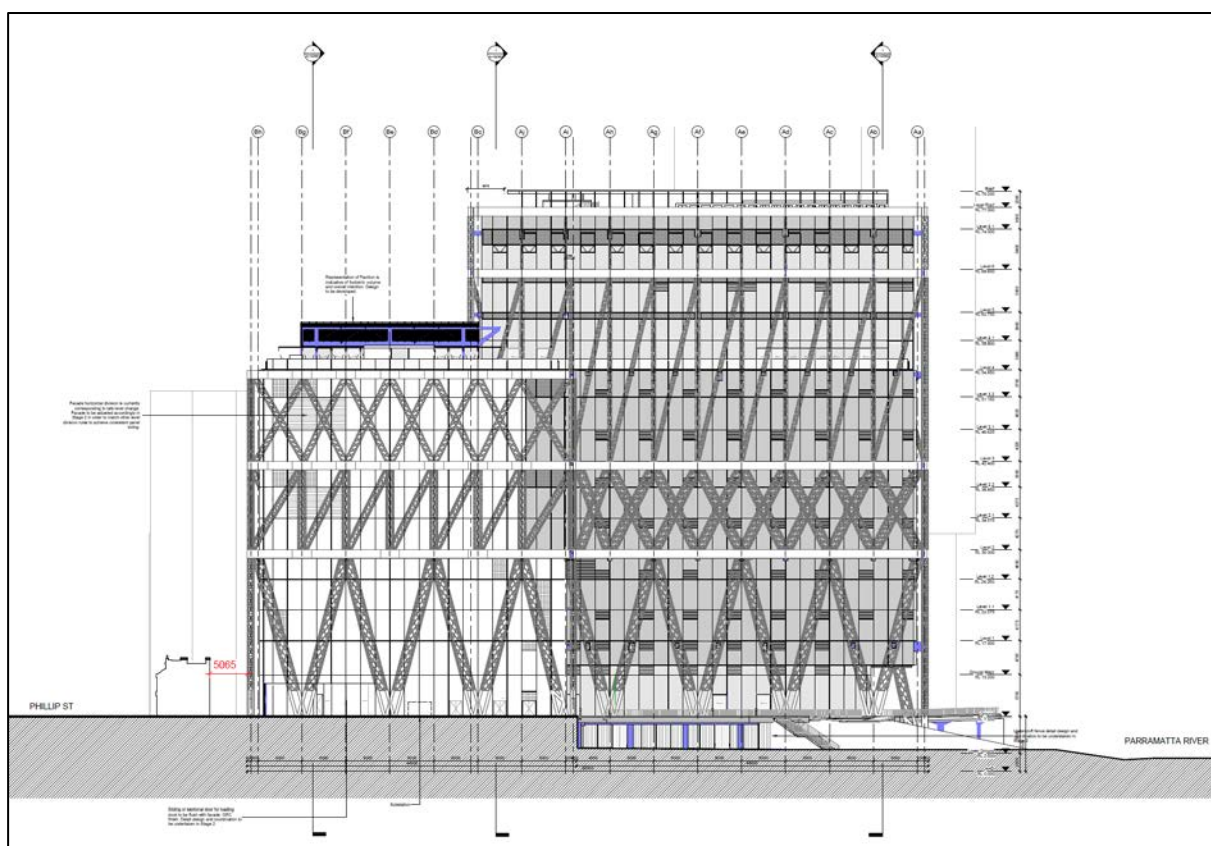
East elevation of the Powerhouse Parramatta showing the proposed setback to the remaining original brick structure of St George's Terrace (Source: Moreau Kusunoki and Genton, 2020).
